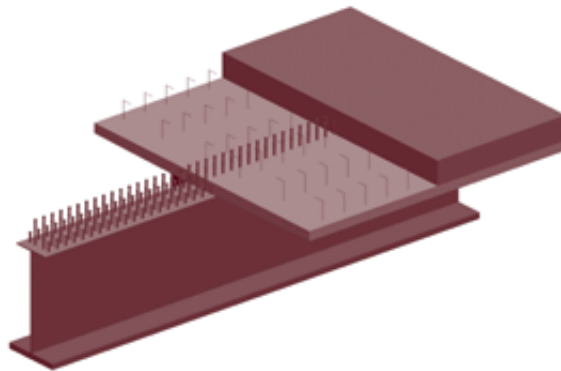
Partial-depth concrete deck prefabricated on steel beams.
